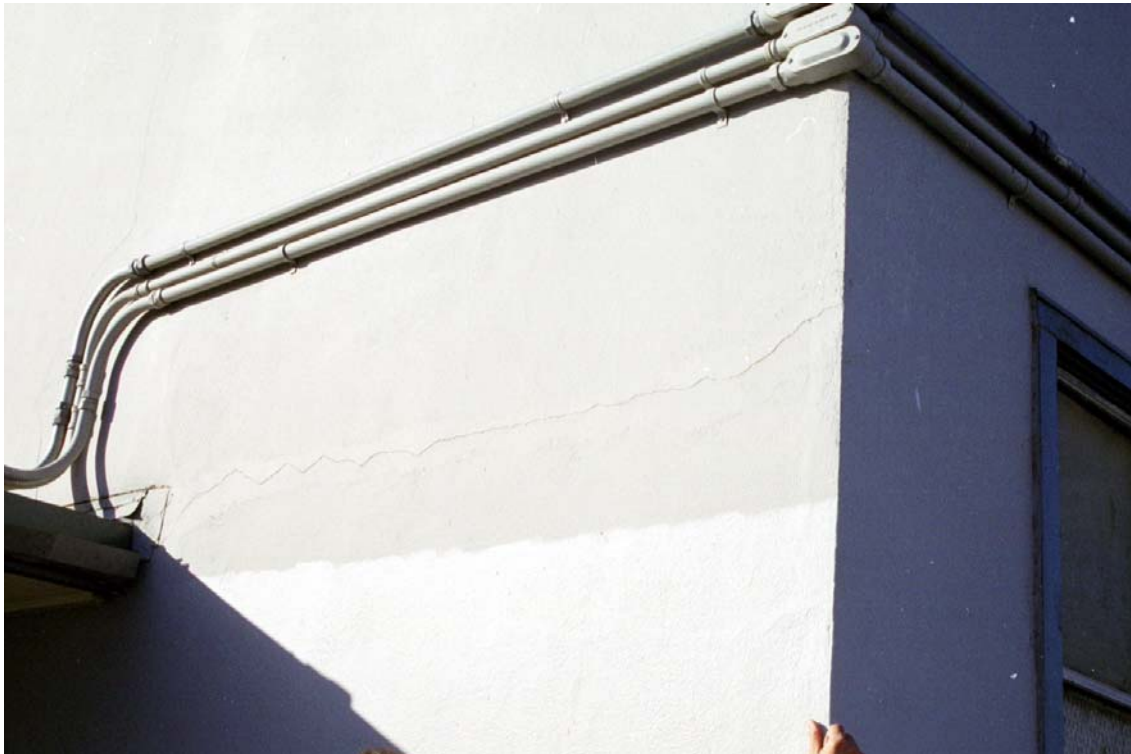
Cracks in Stucco at South Corner of Multi-Purpose Room
